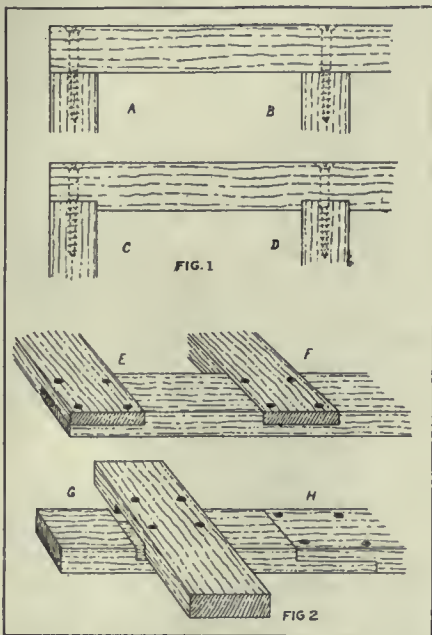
EXAMPLES OF PLAIN AND REBATED JOINTS. FIG. 2. HALF LAP OR HALVED JOINT.
